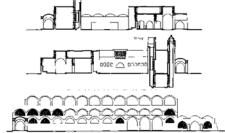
Footage of al-Qurna village buildings. Available on: www.emeco.com last Access 10-4-2022
